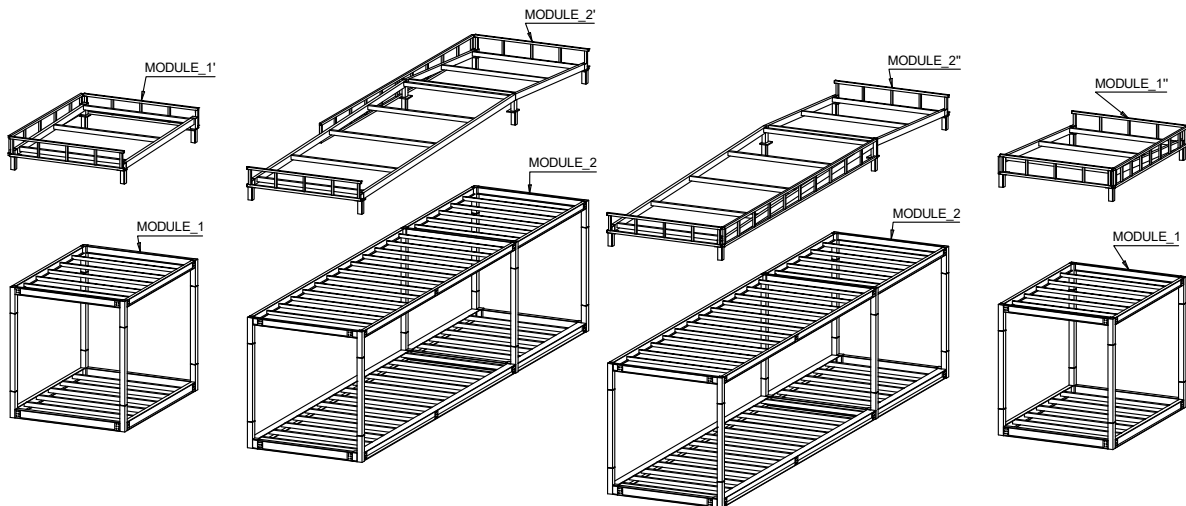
One story housing unit consisting of 8 separate modules – disassembled
